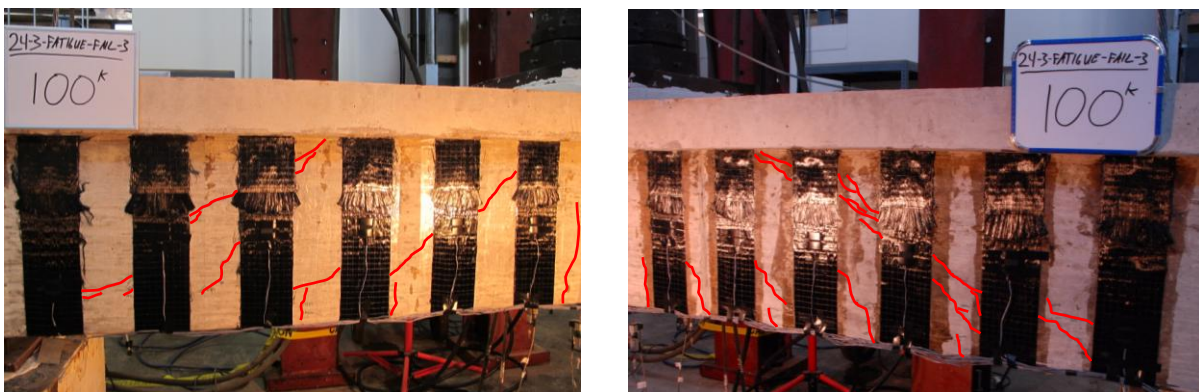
24-3-Fatigue-3&4 unbonded (left) and bonded (right) CFRP test specimen
